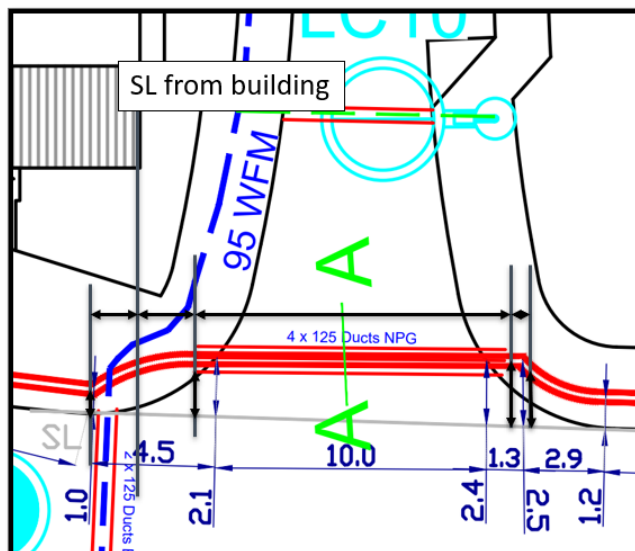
Dimensions to start/end of ducts and cable points taken from an additional sight line in order to make this acceptable.
